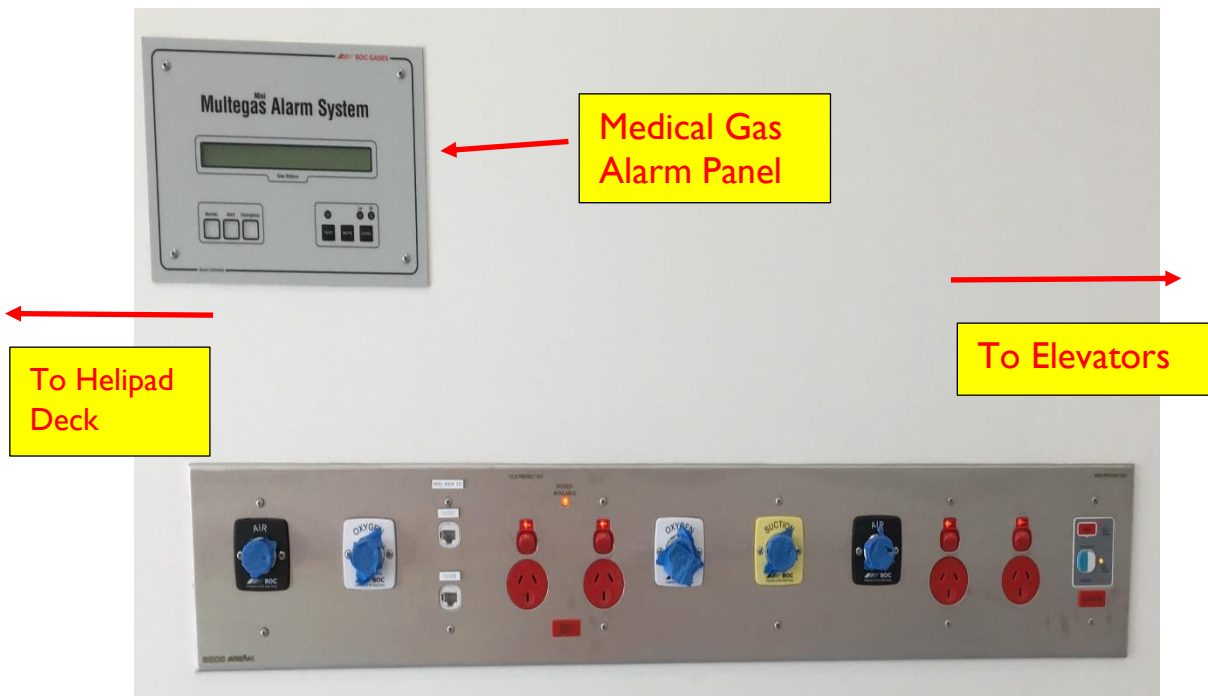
Heliport Lift Lobby Equipment – Southern Wall – Medical Gas Valves / Indicators
